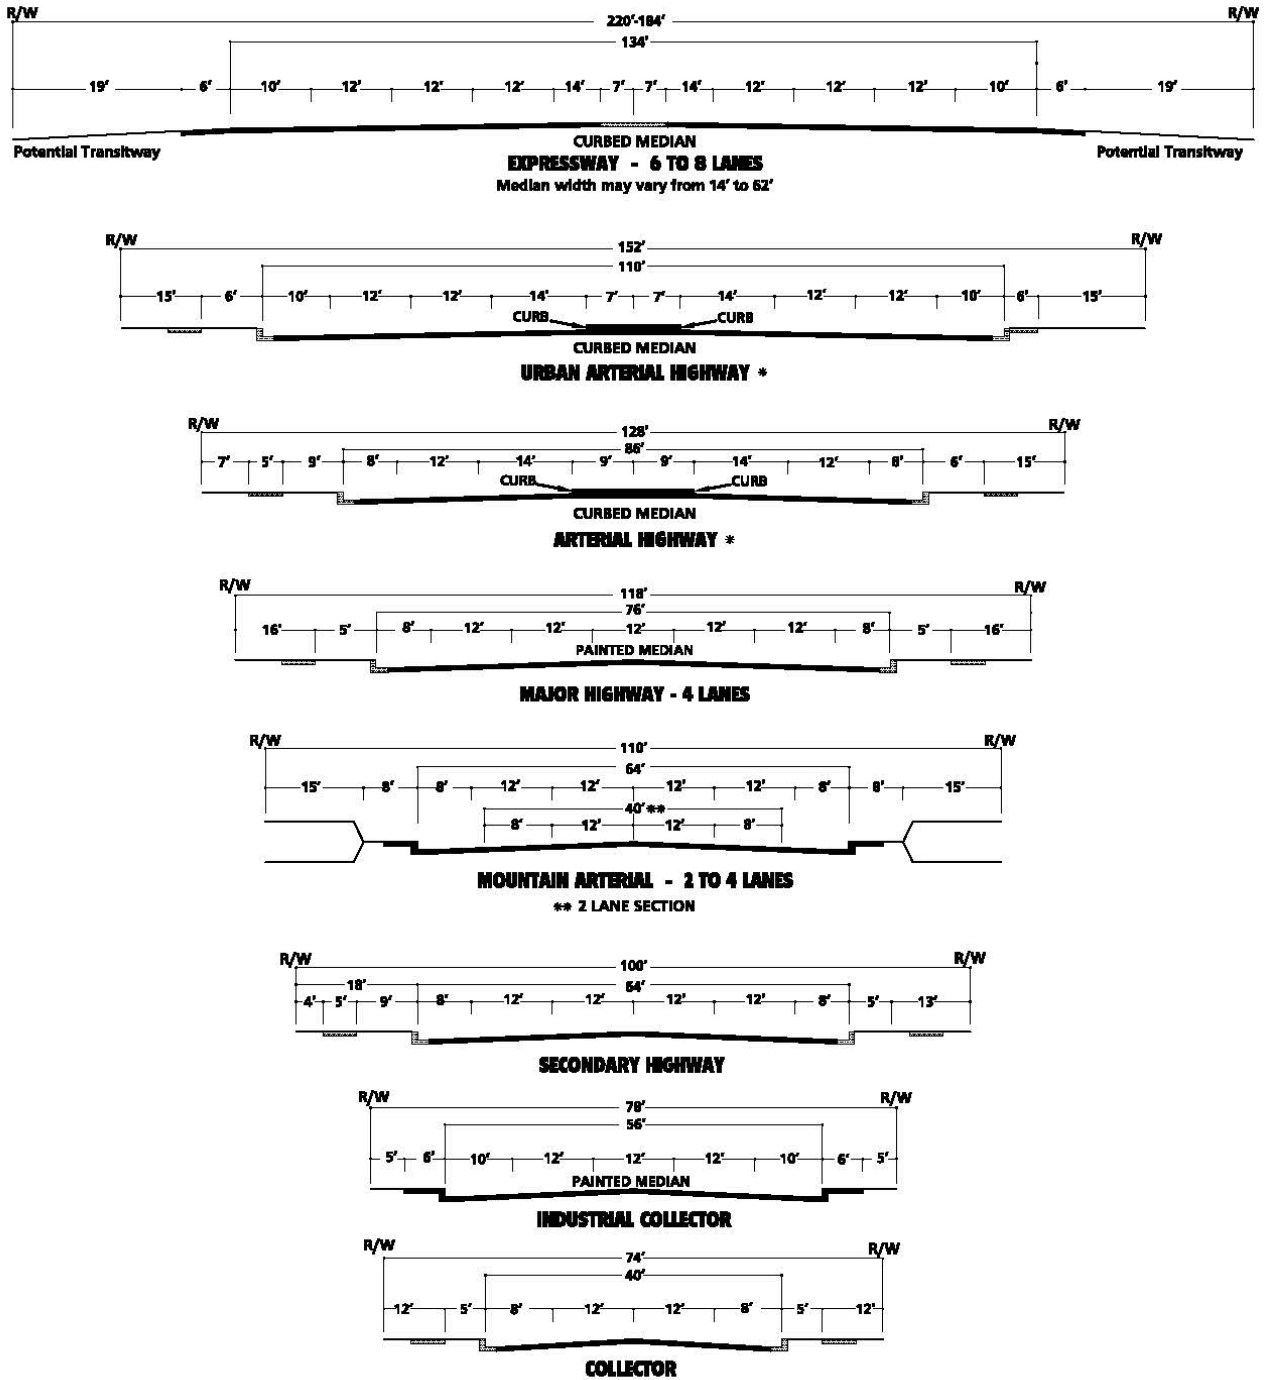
COUNTY OF RIVERSIDE GENERAL PLAN ROADWAY CROSS-SECTIONS
